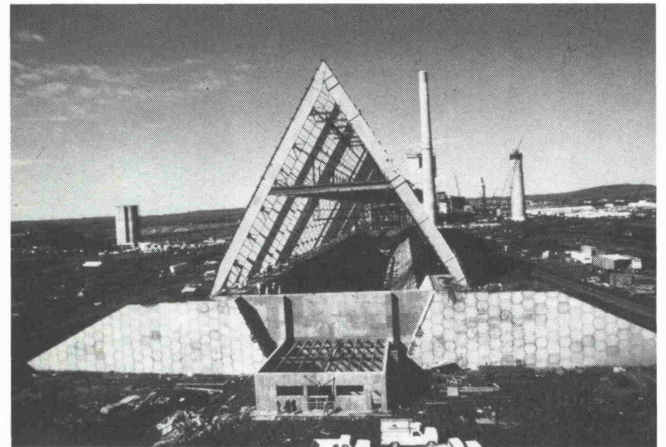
A-framed roof covers 46,000 ton slot built by Basin Electric at its Antelope Valley Station near Beulah, North Dakota. Its inclined (65°) sidewalls and wingwalls are built of REINFORCED EARTH
